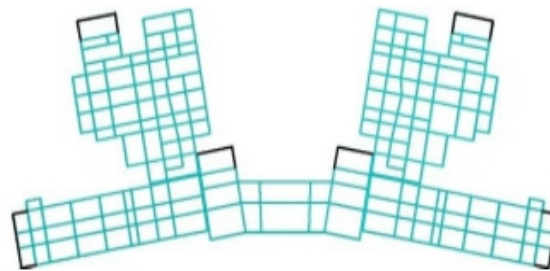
Plan of the Academic building of the ICAFI University, Tripura with shear-wall at the extreme corners and sides modeled in STAAD Pro V8i
